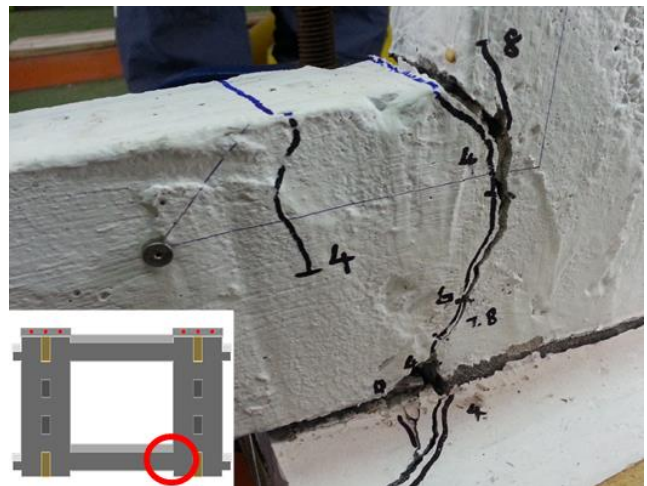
(b) Beam Elements Separated from the Structure at Bottom Right Part and Reinforcement Exposed
